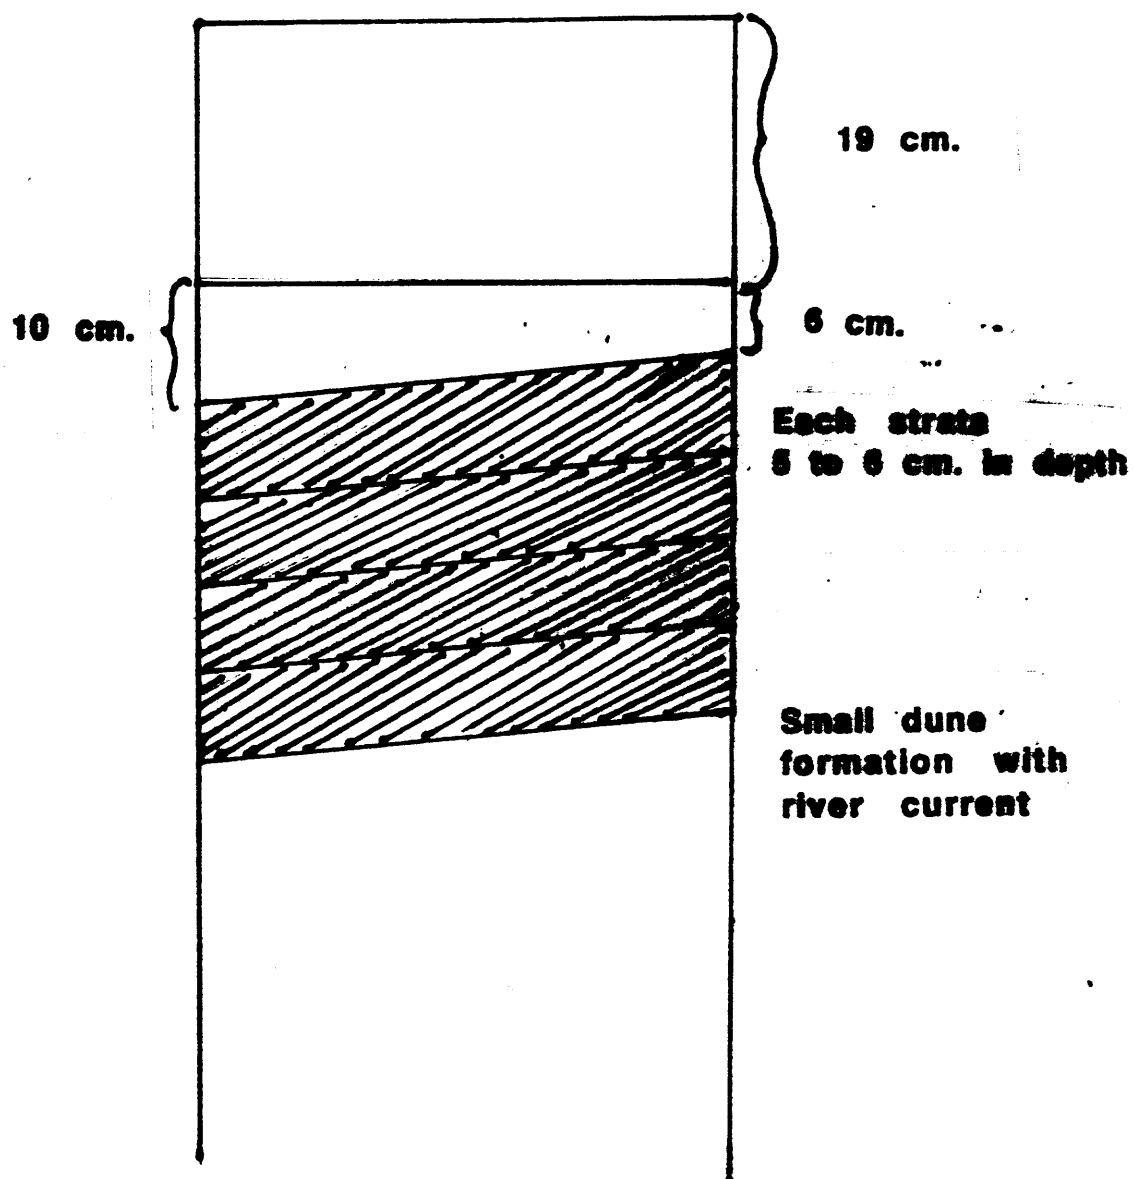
TRENCH CROSS-SECTION MILE 81.3
